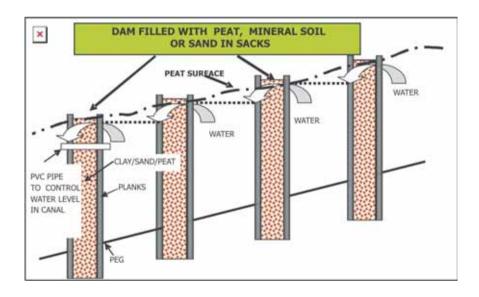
Cross section of several composite dams built in stages in a ditch/canal (Stoneman and Brooks, 1997)
